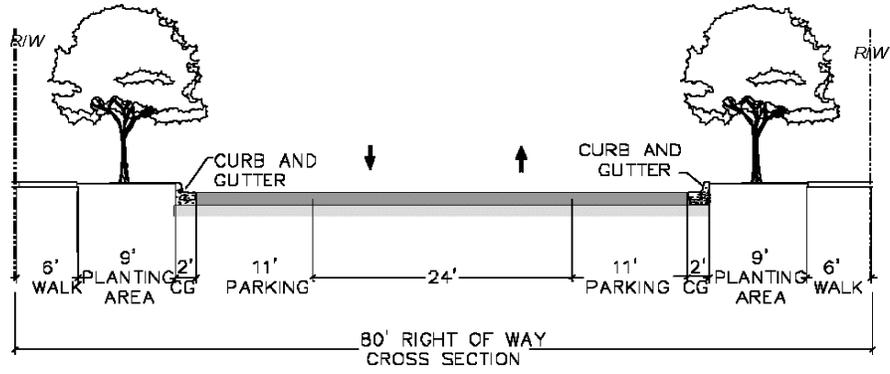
Secondary Street 80' Right-of-Way Cross-Section with On-Street Parking
